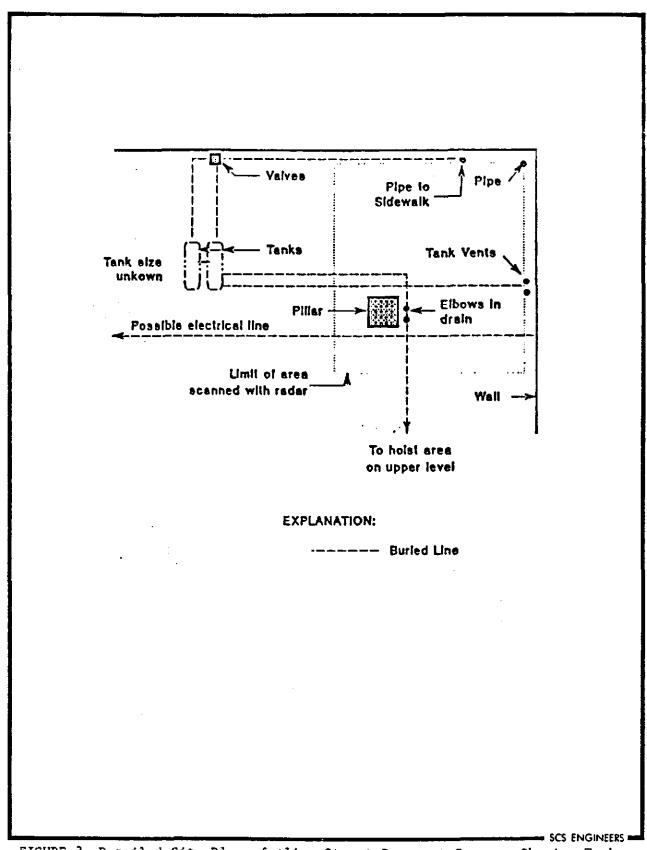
Detailed Site Plan of Alice Street Basement Garage, Showing Tank and Associated Piping Locations based on Geophysical Survey
